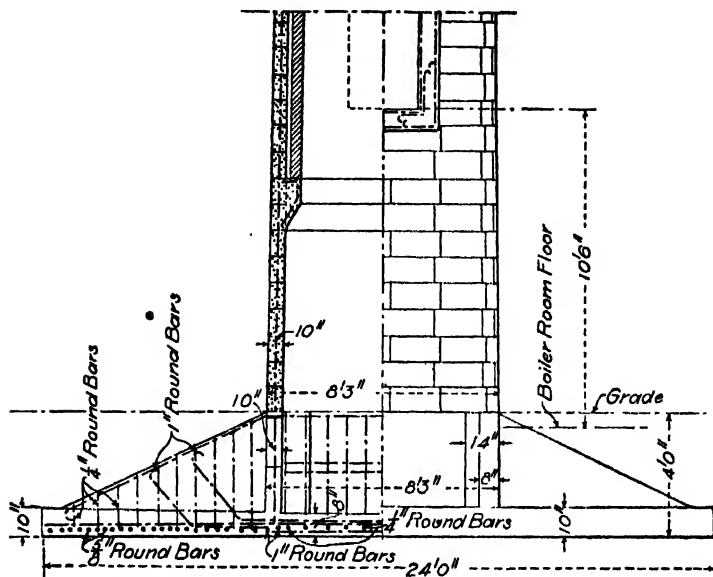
Slab and Box Footing of Reinforced Concrete for a 125-Foot Chimney in Chicago.
